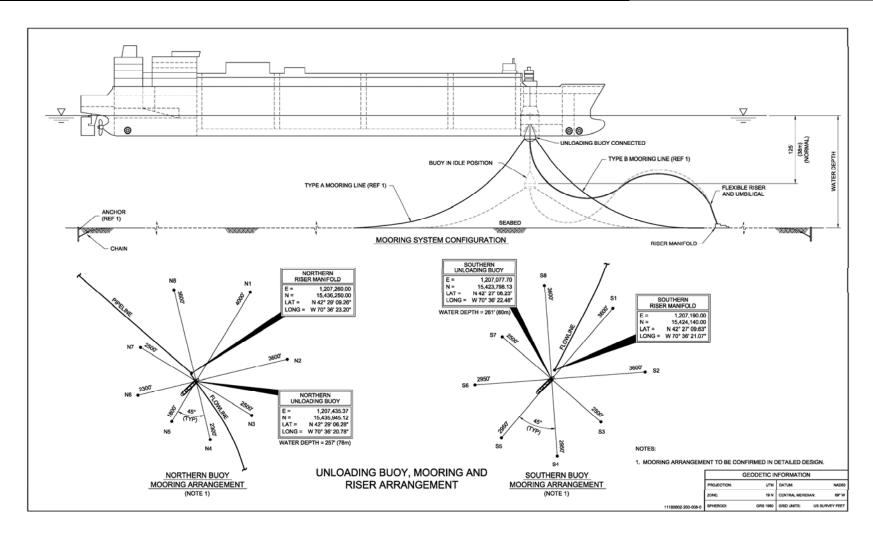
Unloading Buoy, Mooring and Riser Arrangement
